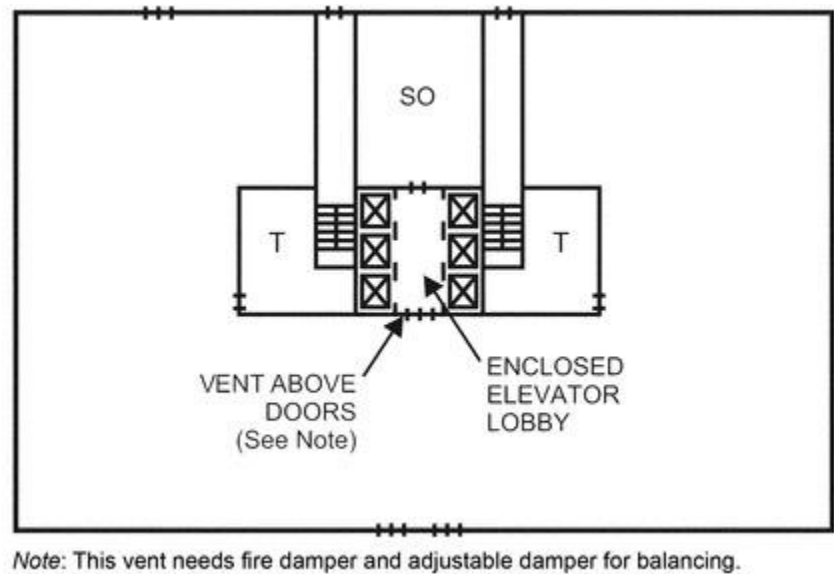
Ground Floor of Building with Ground-Floor Lobby (GFL) System
